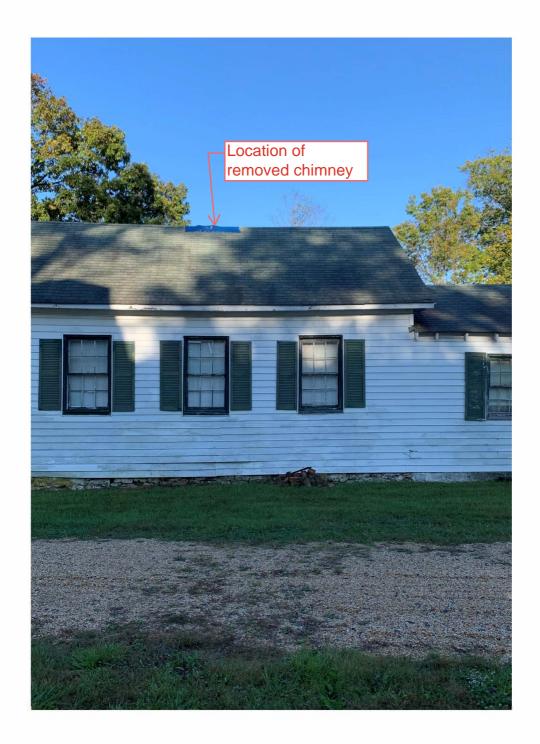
Martinsburg School - East Elevation View - October 6, 2020
